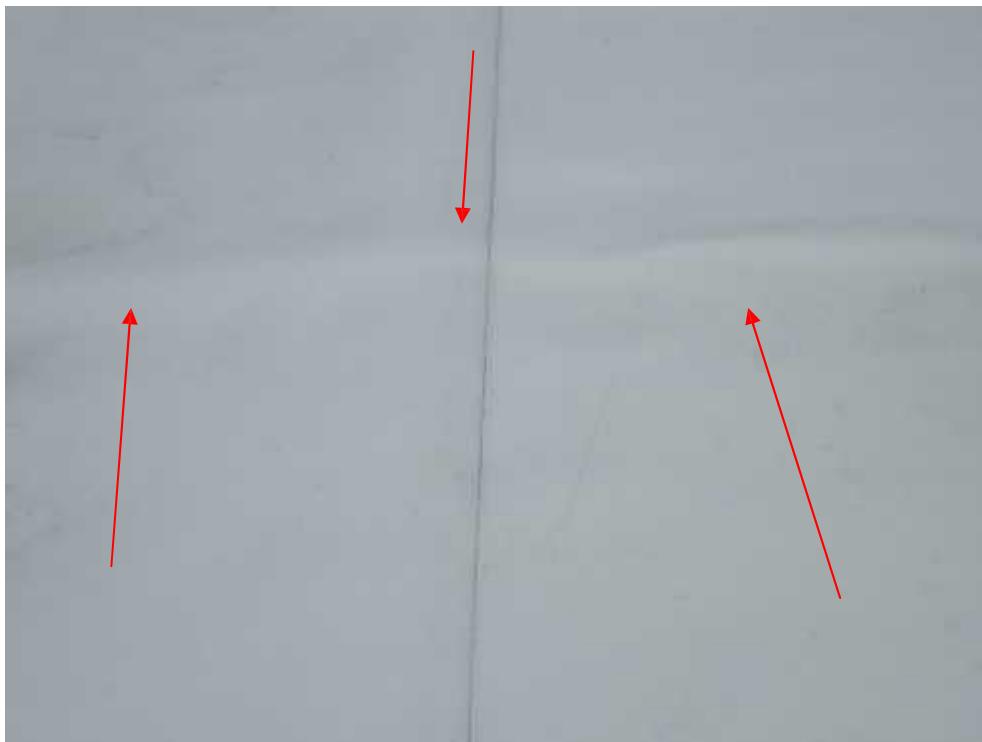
Roof Area 4.1 – Cut test location 1 – membrane adhesion to the underlayment board has failed.
